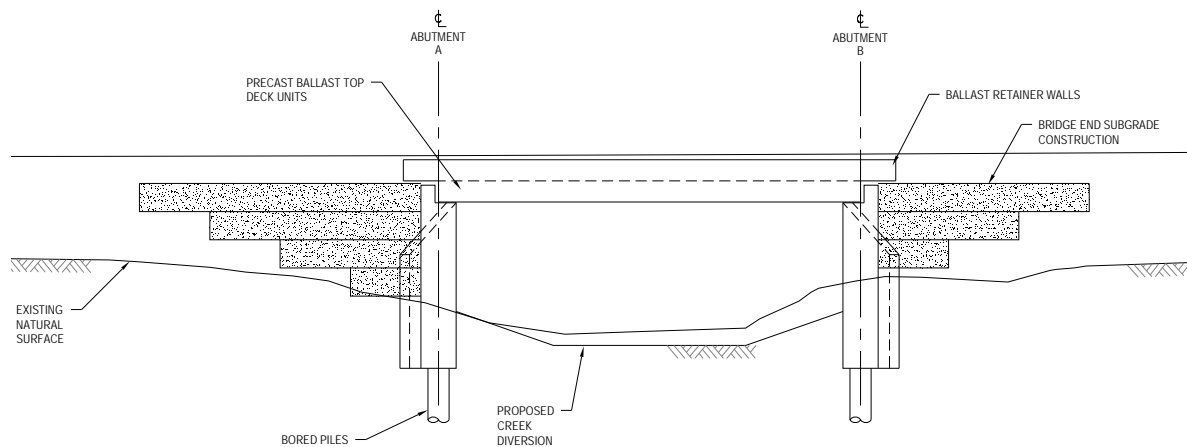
Proposed Underbridge at chainage 207.776 Design Schematic
